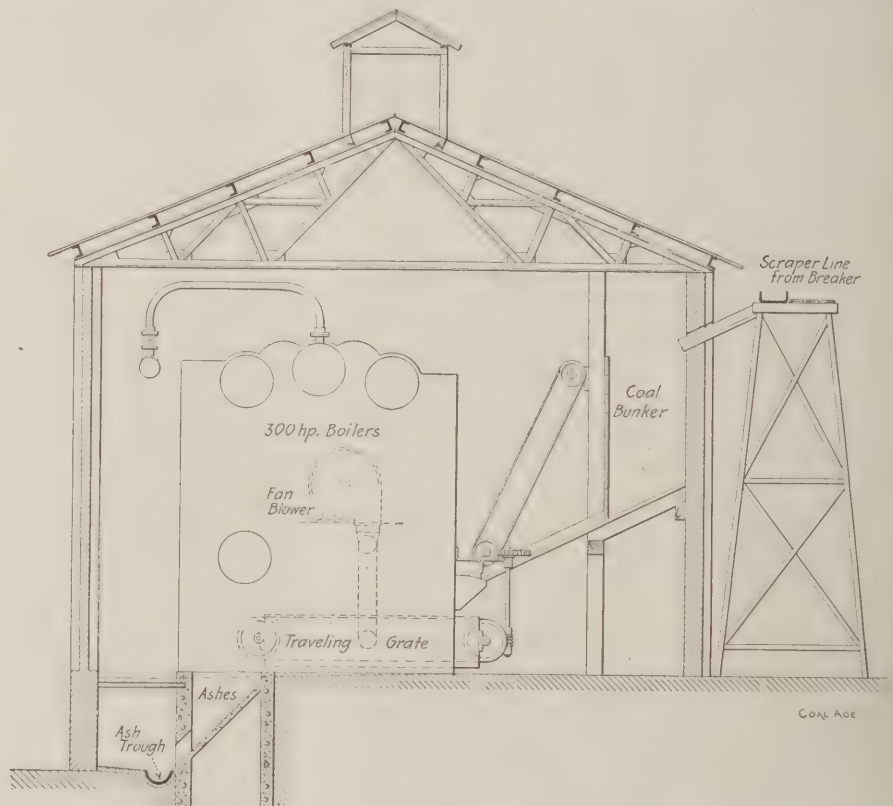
SECTIONAL ELEVATION OF BOILER HOUSE
